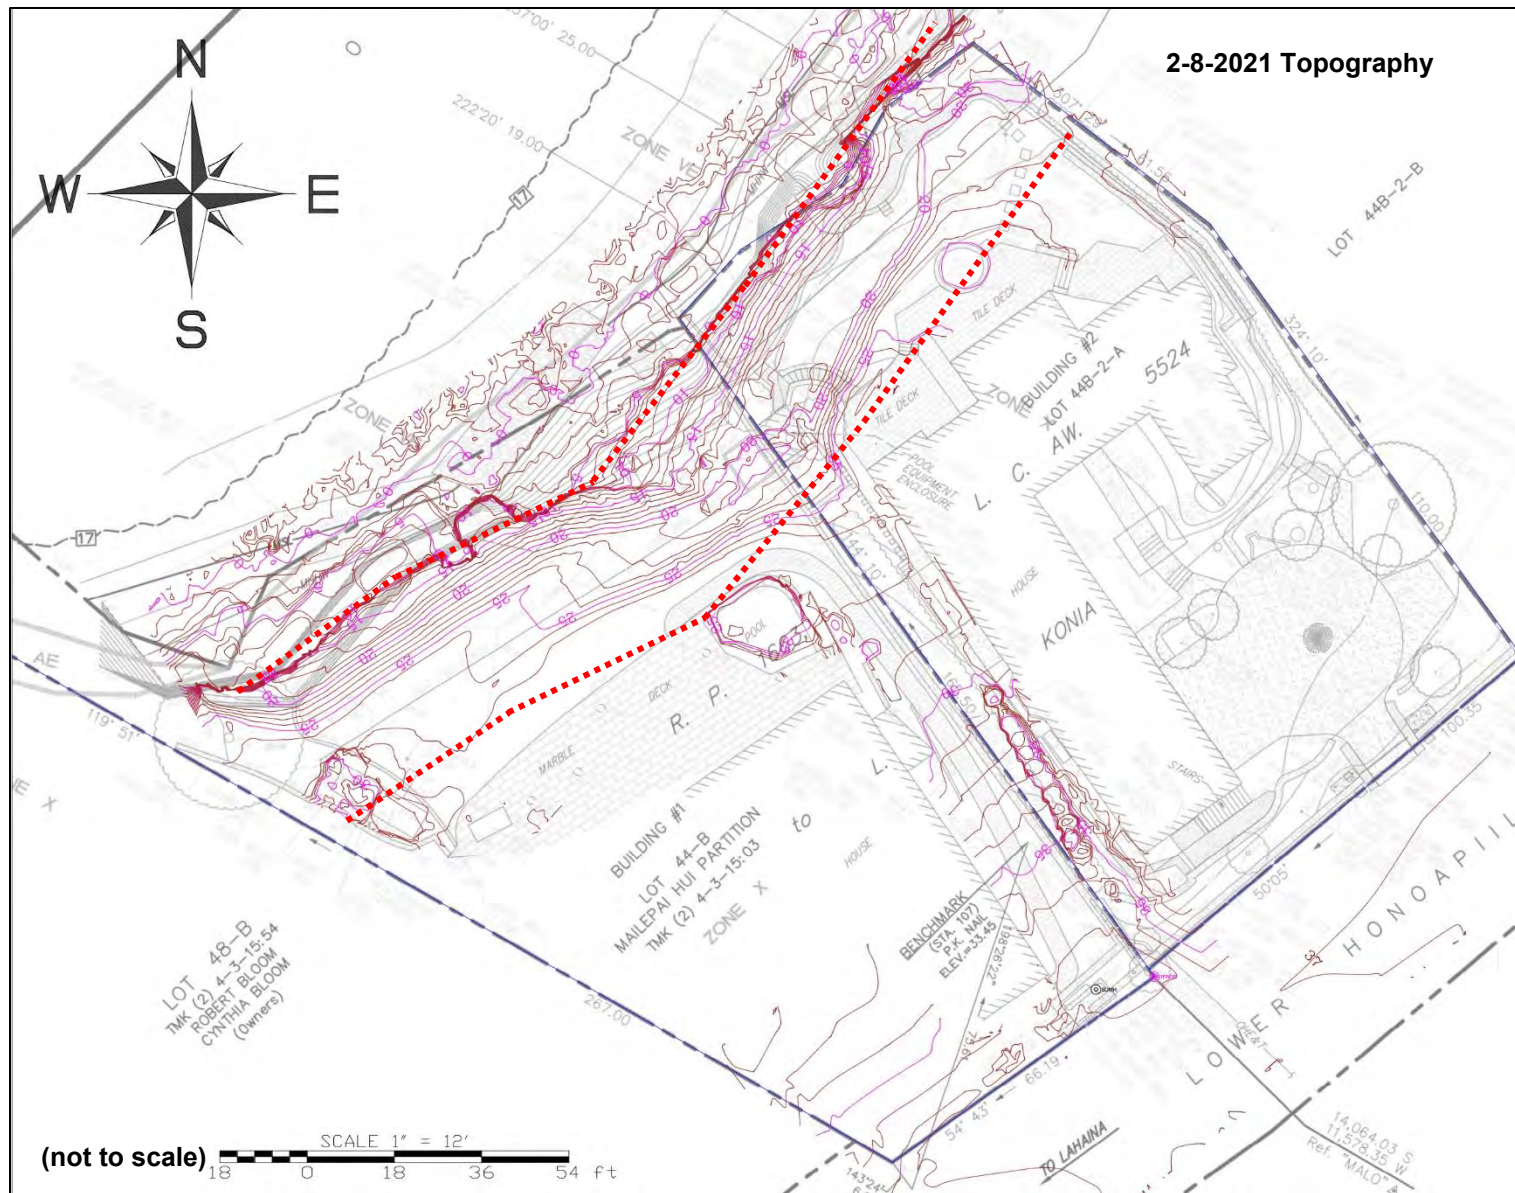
Concept plan view for rock rubblemound revetment alternative
